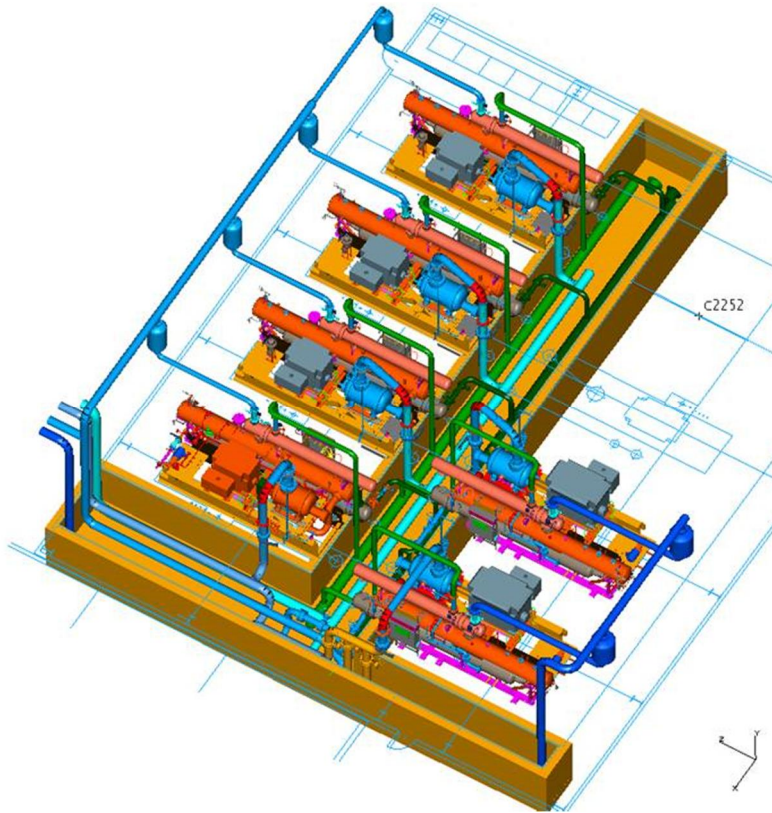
Typical Helium Compressor Room Layout with piping trench, water, and helium piping (example shown includes option spare 6th compressor)
